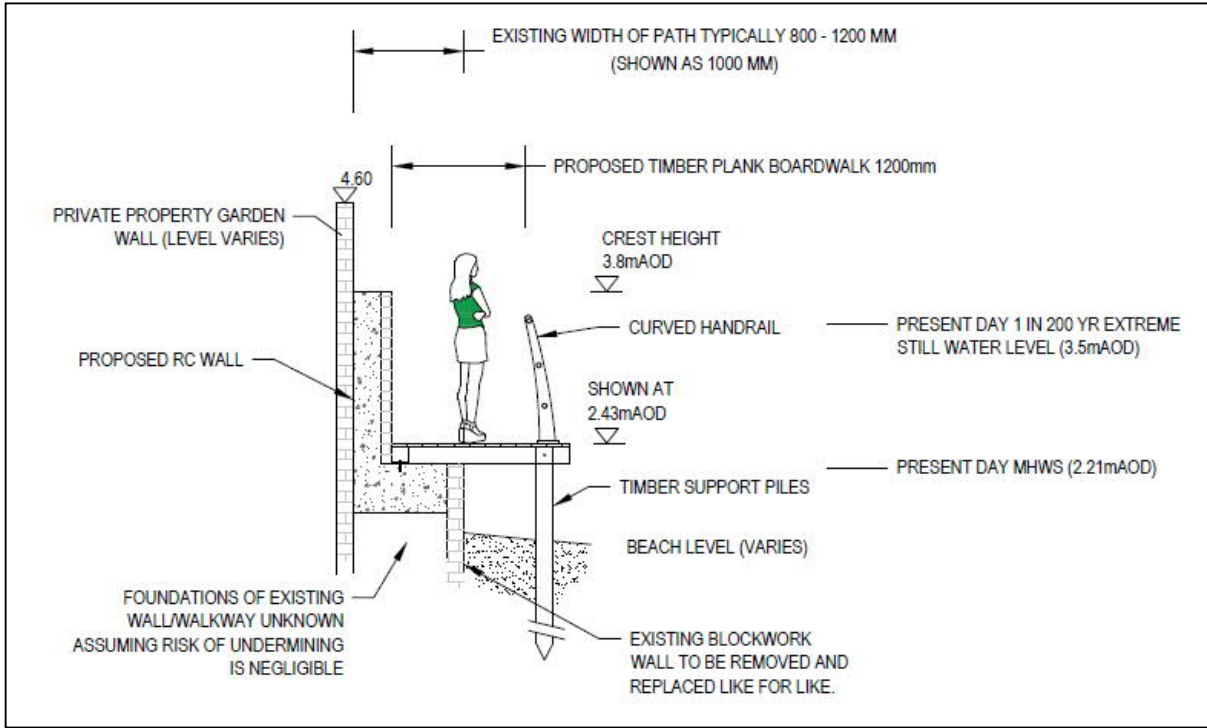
Sketch of indicative boardwalk and floodwall cross section in ODUs 3f-h, using piles to support boardwalk (not to scale).
